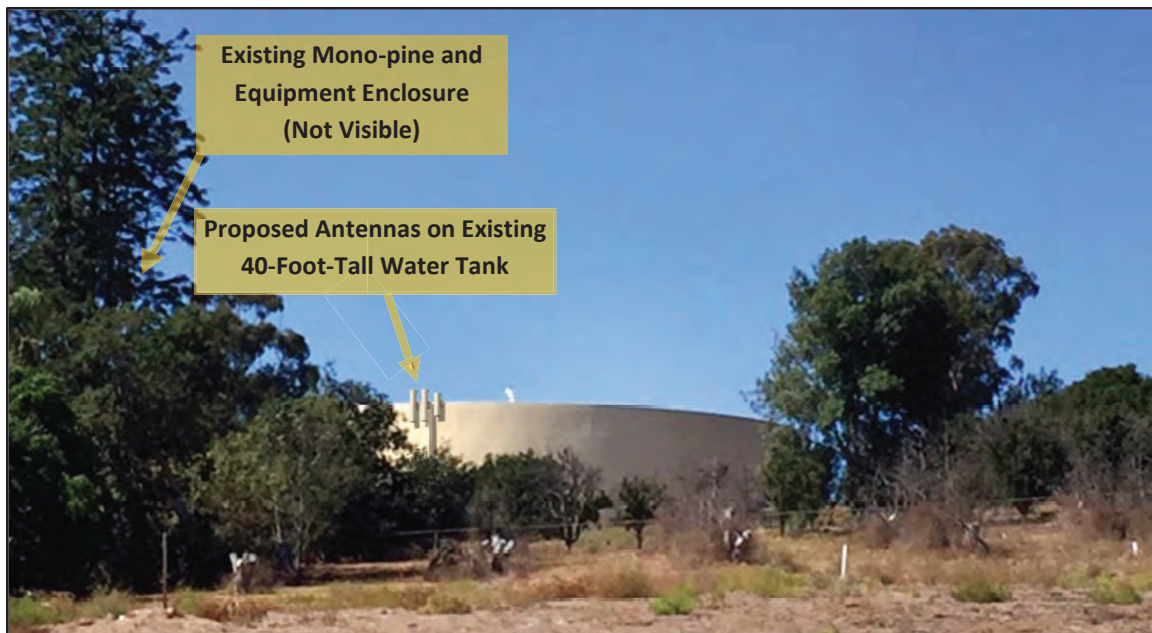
View of one of three proposed water-tank-mounted equipment, looking west from neighboring property.
